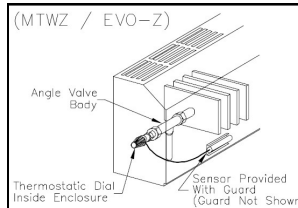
Typical Wall Mounting of EVO-Z / MTWZ Installation for Baseboard.
